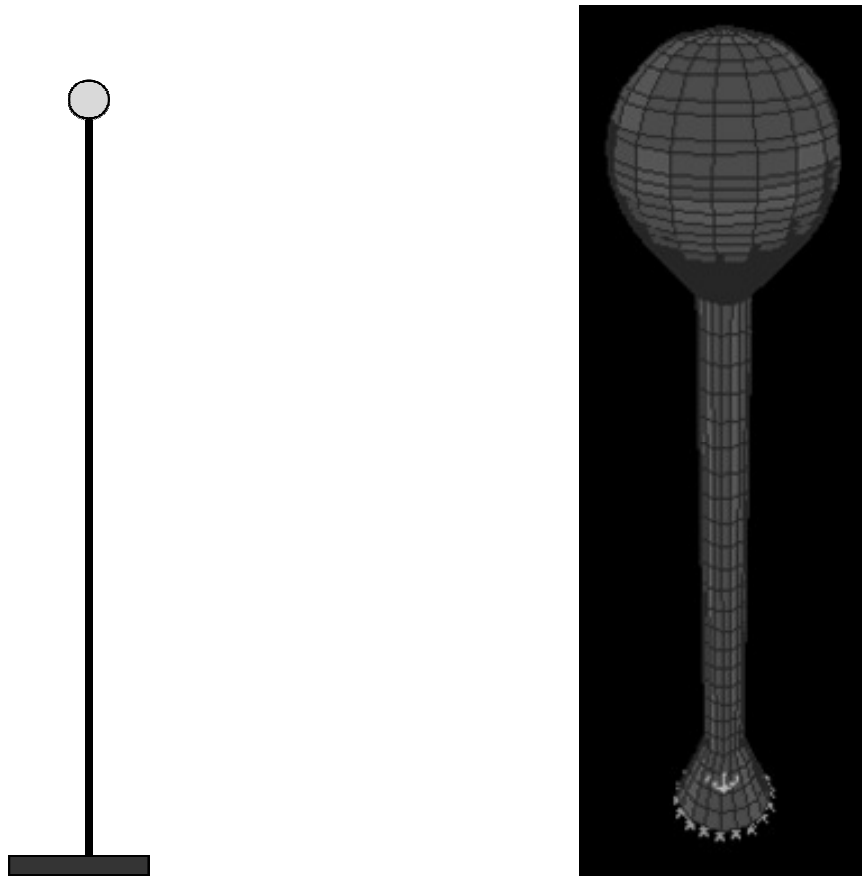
Stick model (left) and 3D model (right) of elevated water tank
